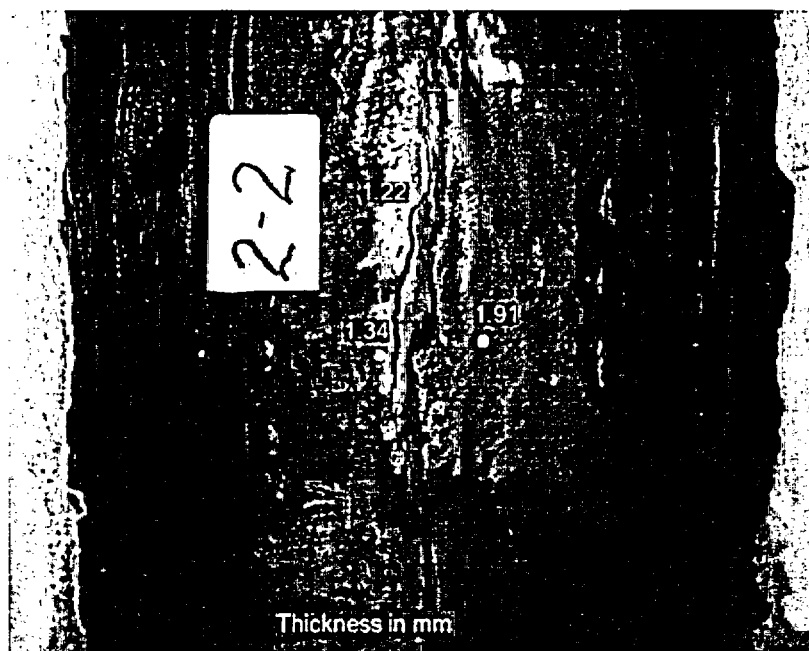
Liner thicknesses (in millimeters) measured ultrasonically in the vicinity of tear #2-2. Note the very wide region of repair welding and grinding. Note also that one measurement is greater than the initial plate thickness due to previous weld repairs.
